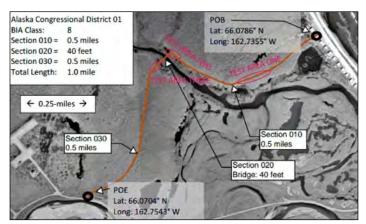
Engineering plans depicting proposed APE, Sections, and Test Areas 1-3.
